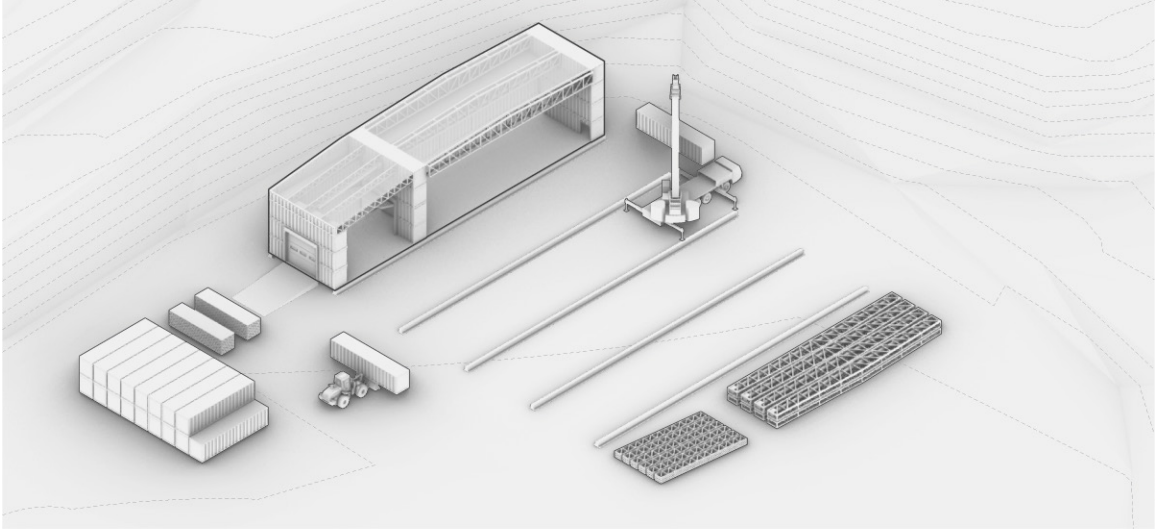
The Factory will be assembled in a series of sections on prefab concrete foundations.
